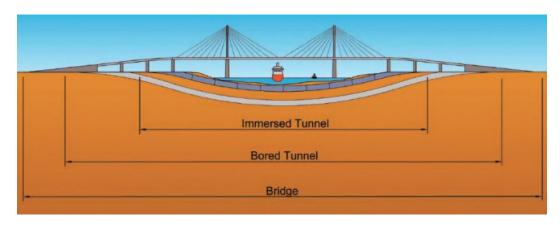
Layout of immersed tunnels (Van Montfort, 2018)
